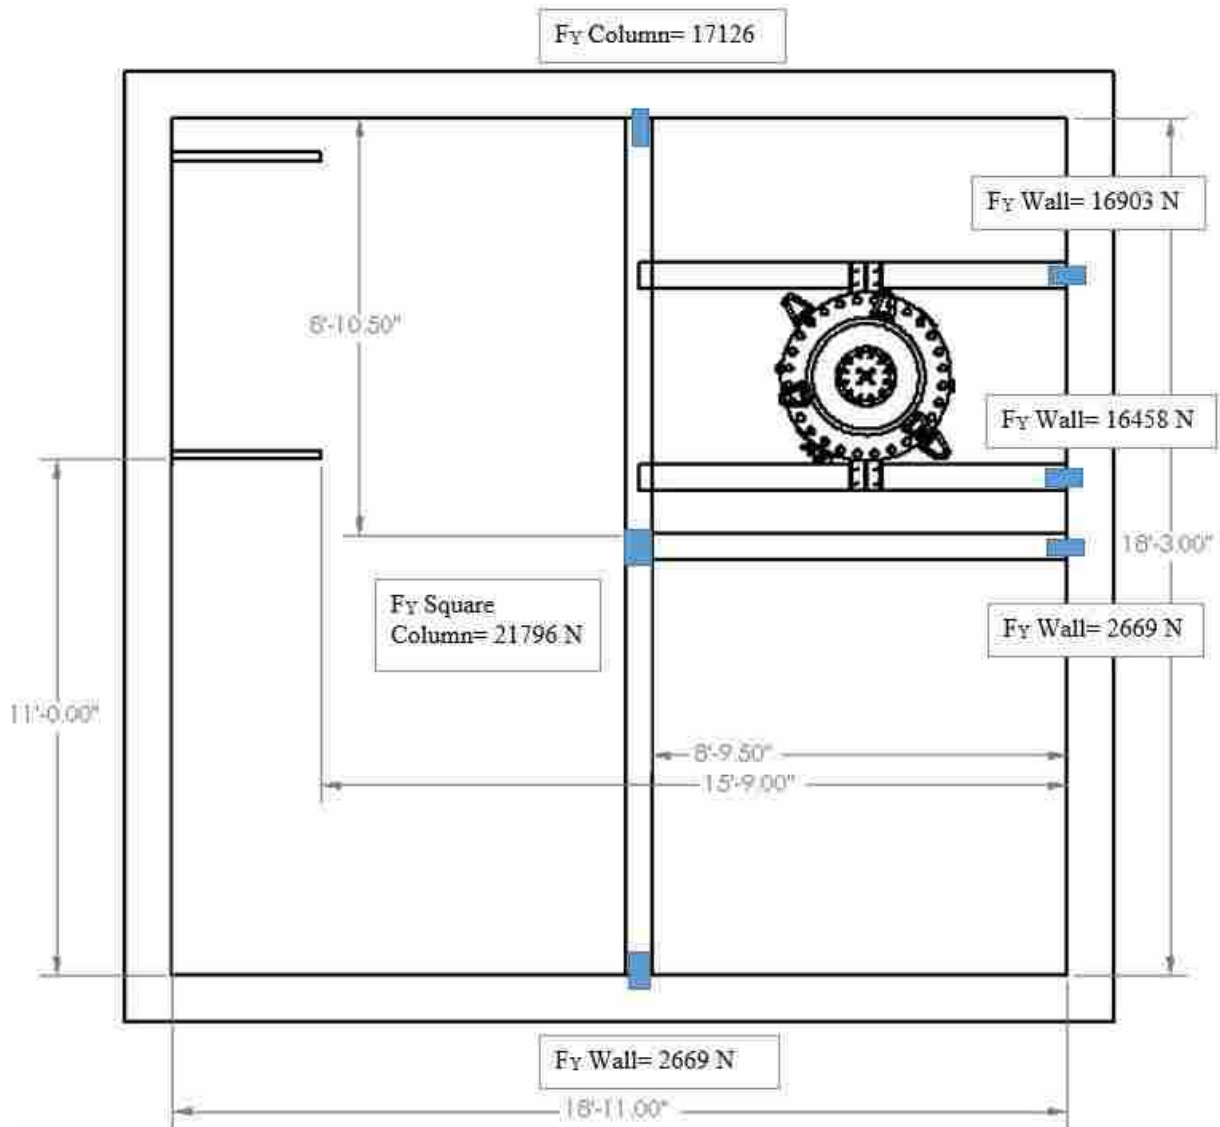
Layout of Reactor Room Support I-Beams and Calculated Forces for Wall and Square Supports.
